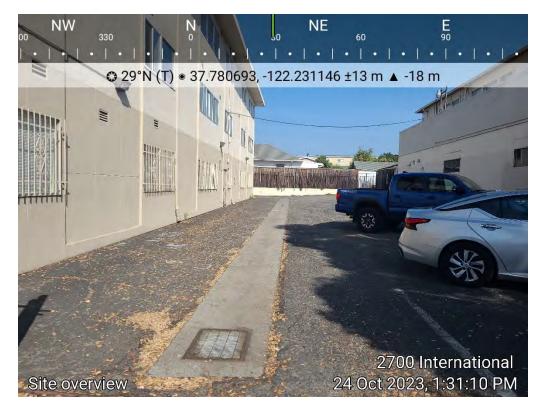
Overview of asphalt parking lot between the two buildings within the Project Area.
